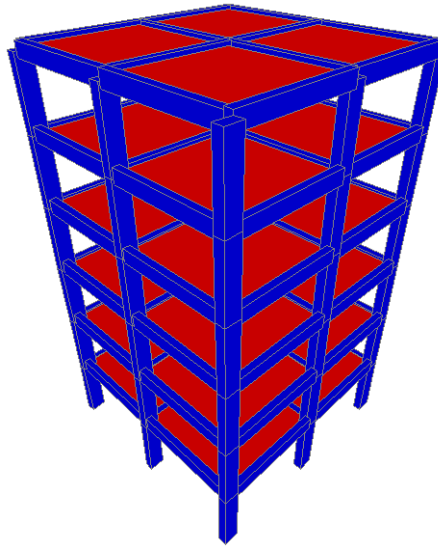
3D Finite Element Model of Reinforced Concrete Structure
